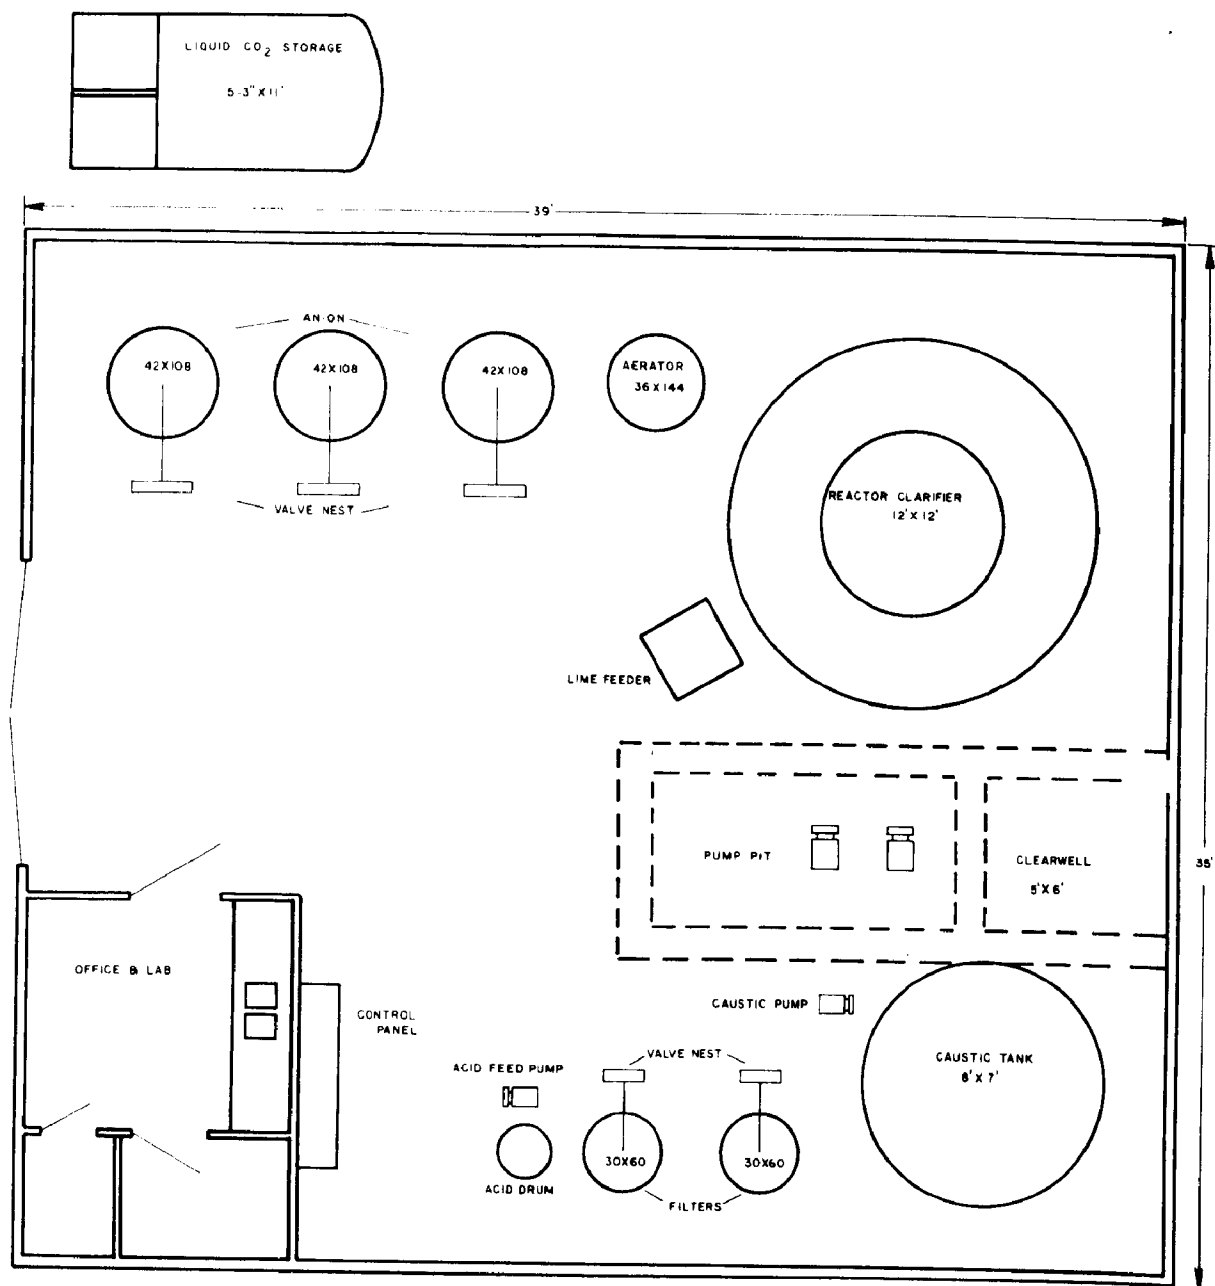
AMD Treatment Plant Plan, Modified Desal System, , 0.1 MGD
